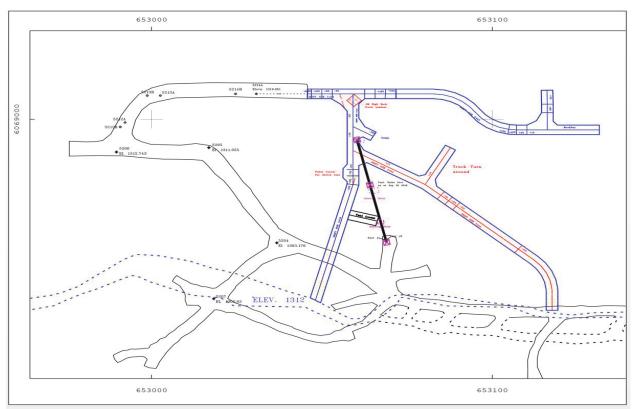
1312 Stope Access Plan and Ventilation Raise from 1290 to 1370 Level
